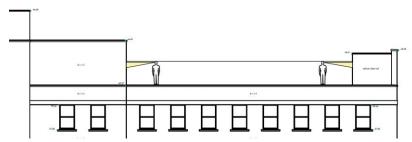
Proposed Drawing Extract showing the north-west elevation of the roof level (Interaction)
